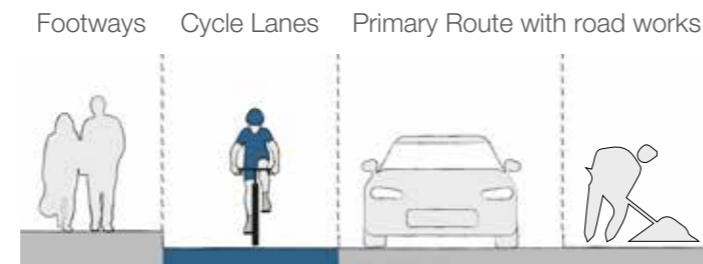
Cycling lane to be provided while road works are undertaken.
